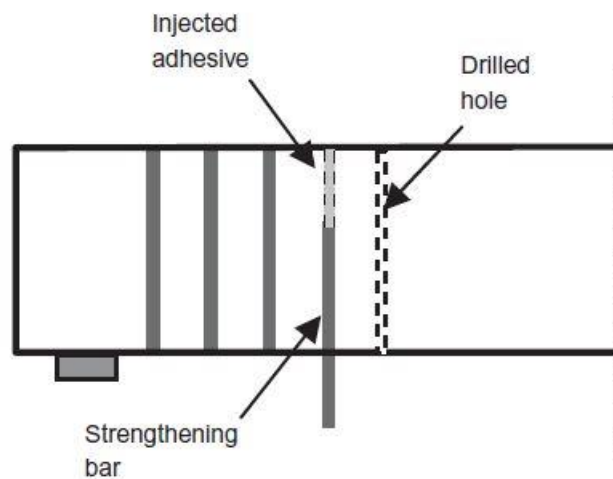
Shear repair using the embedded reinforcement method (Valerio, 2009)
